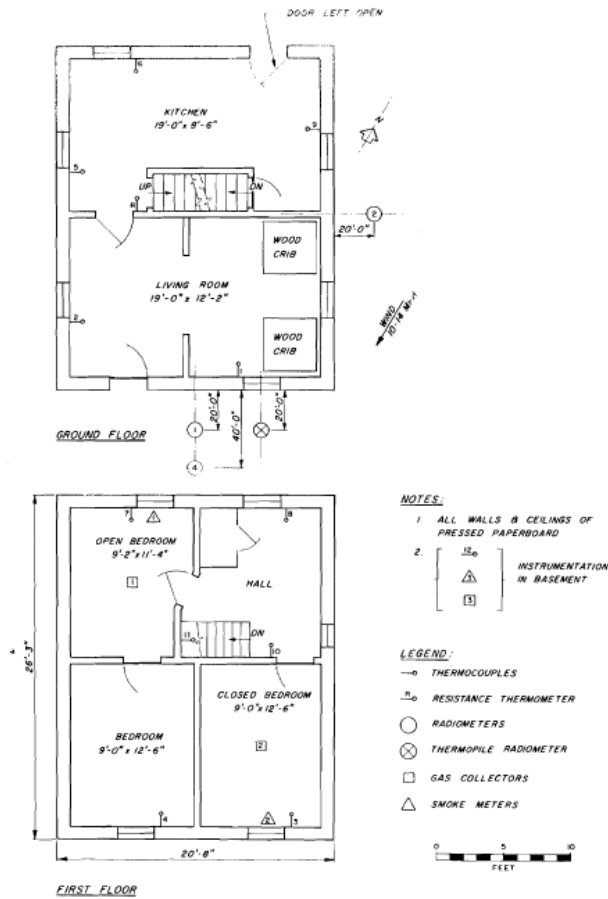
Building No. 5 – Two-storey wood frame building with clapboard cladding. The position of the radiometers and a plan view of the experiment are shown (figure modified from [54]).
